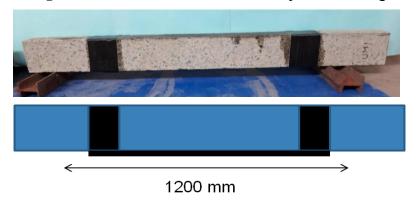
'M1' and 'M2' beams with U wrap anchorage
